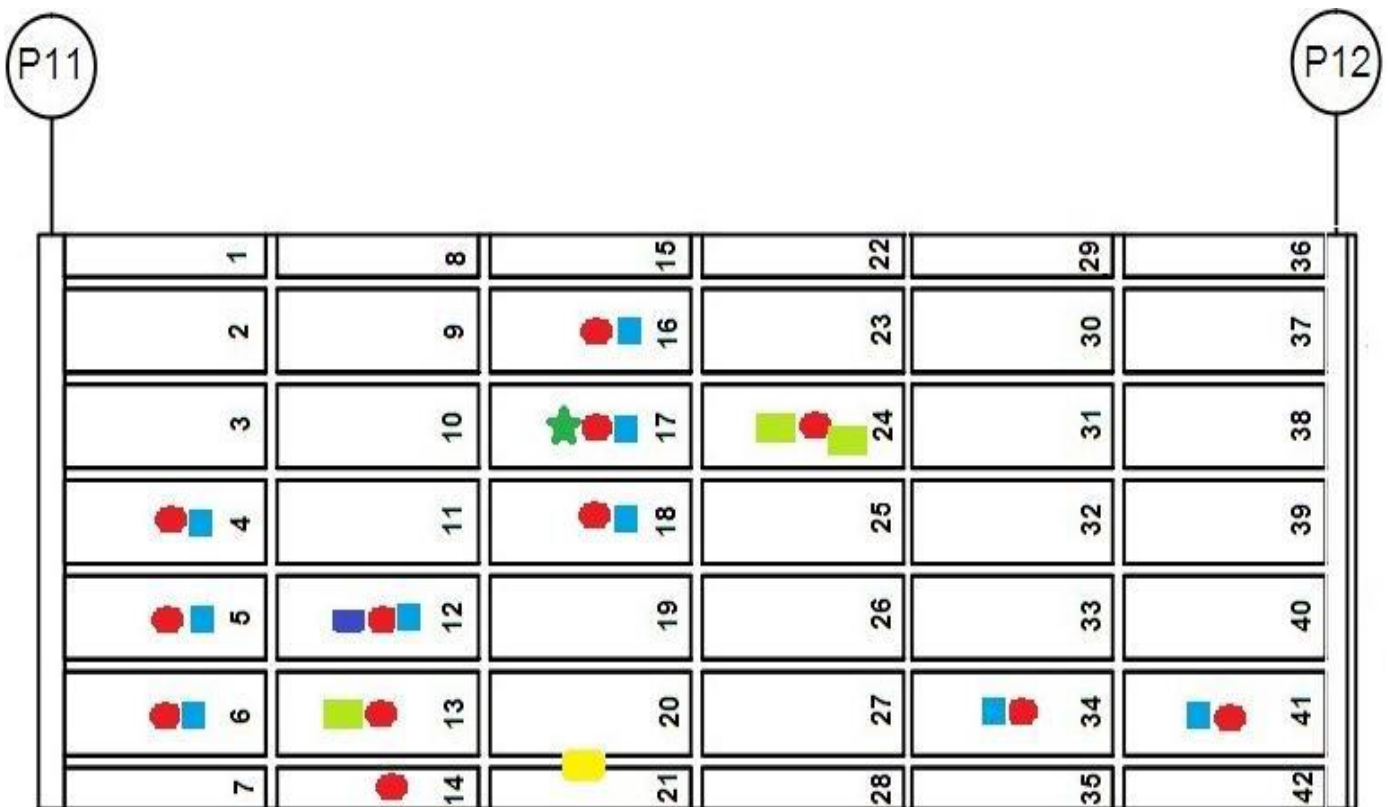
Test conducted at various locations between Pier P11 and Pier P12
